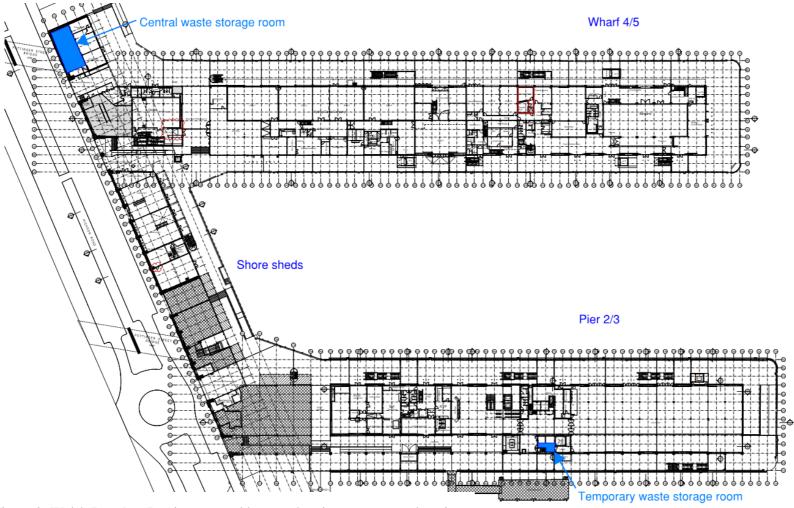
Walsh Bay Arts Precinct general layout, showing waste room location
